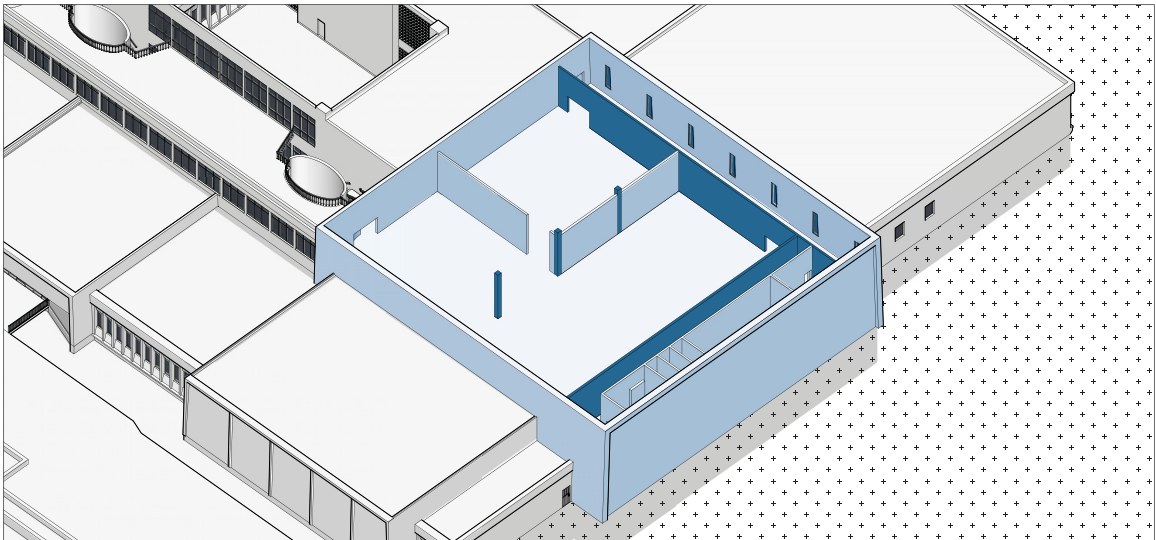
East Exhibition Room Floor 1 & 2 (1304 m²) will be converted to the school of architecture
